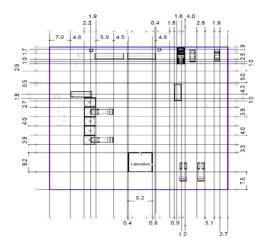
Plan for batching plant for concrete with grid-to-grid distance.
